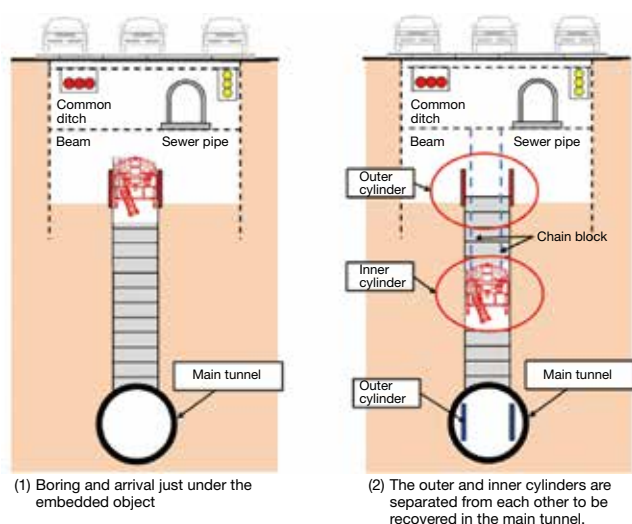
Conceptual diagram of the upward shield machine removable through a tube
